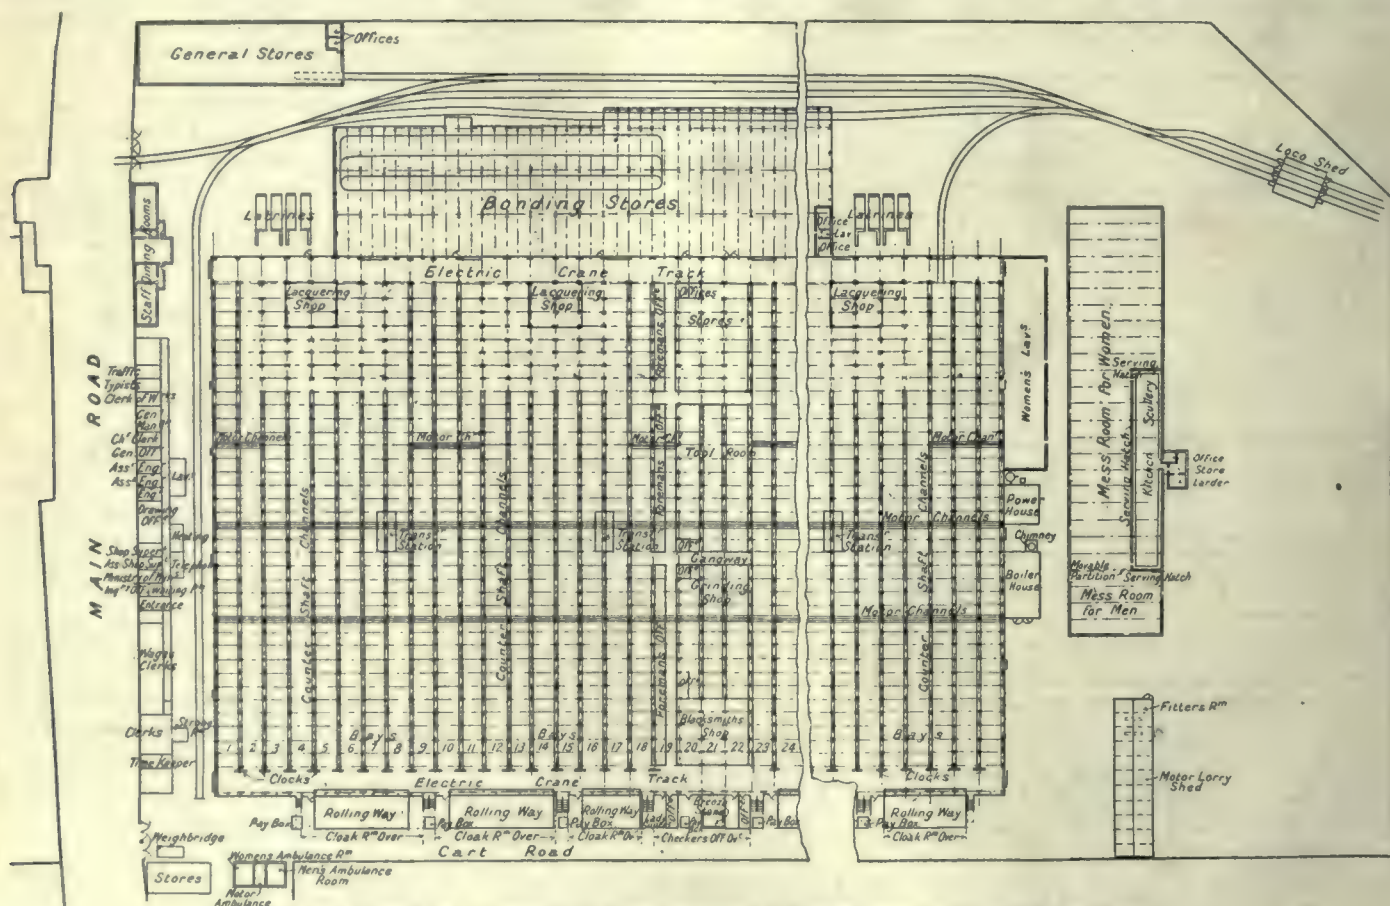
LAYOUT OF MACHINING DEPARTMENT, BRITISH NATIONAL SHELL PLANT.
